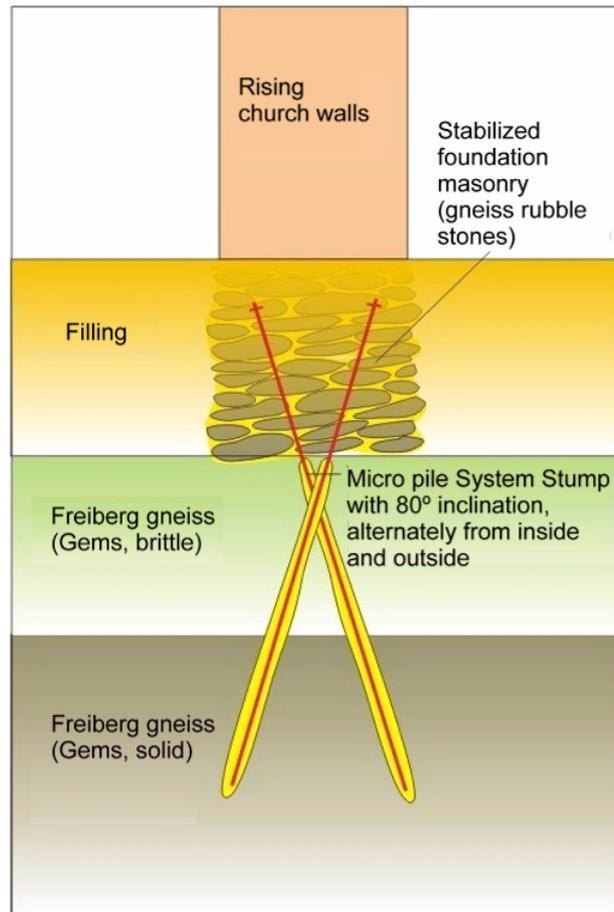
Interlocking-sword pile arrangement at foundation penetration (Jacobi Church, Freiberg)
